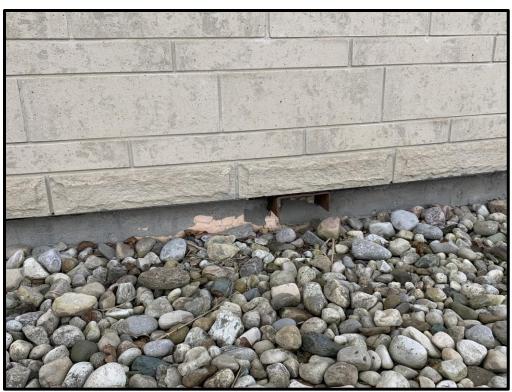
Detail of foundation and landscaping treatment (Photo taken on March 11, 2020; Facing West)
